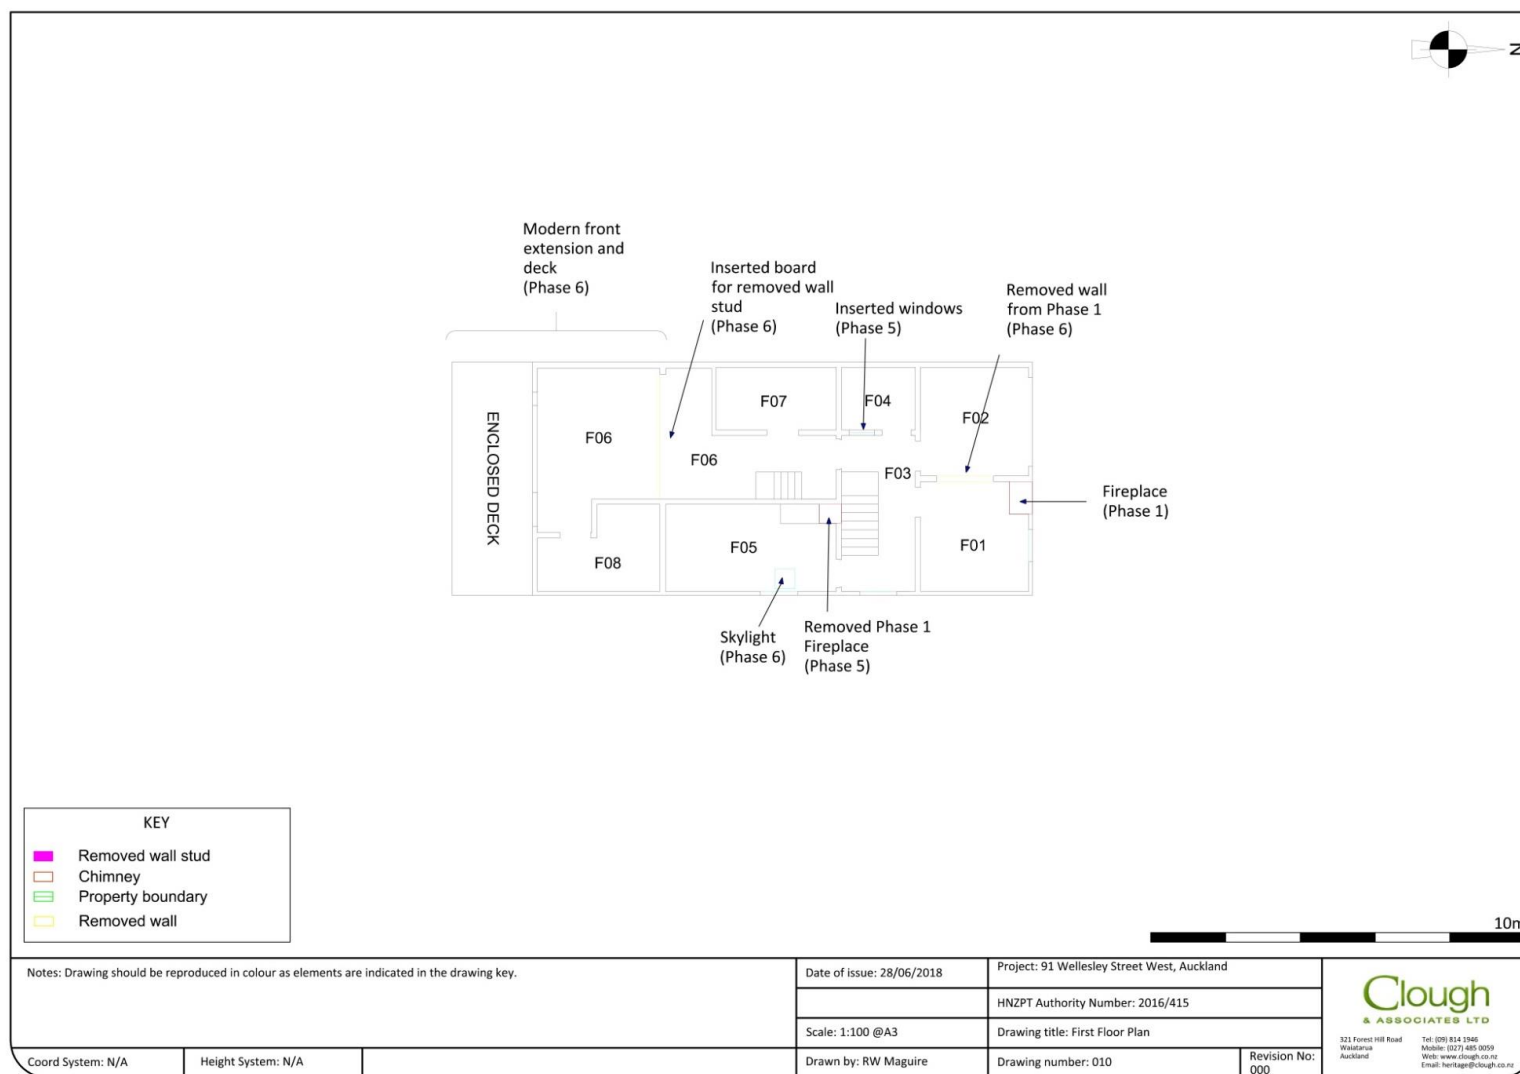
First floor plan of 91 Wellesley Street West (source: Clough & Associates, 2015)
